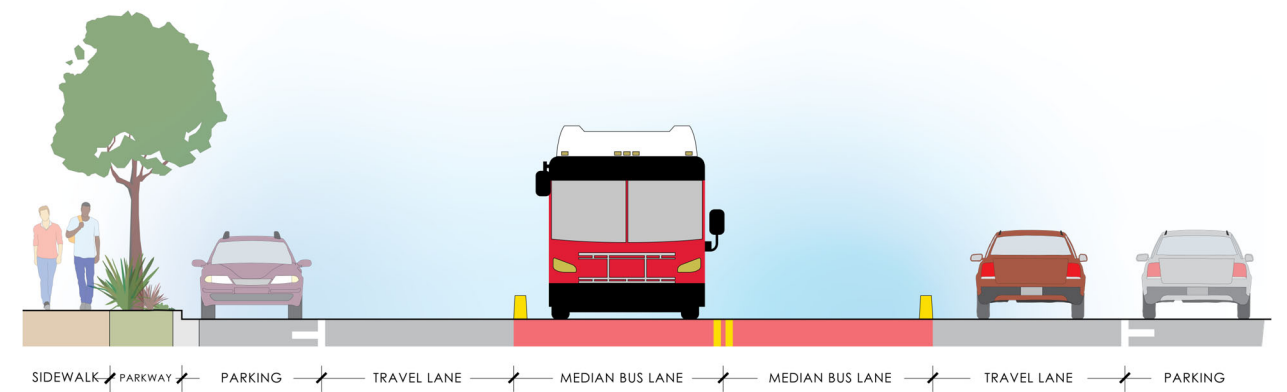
CENTER RUNNING TRANSIT LANES THROUGH THE LOCATION SECTION VIEW
